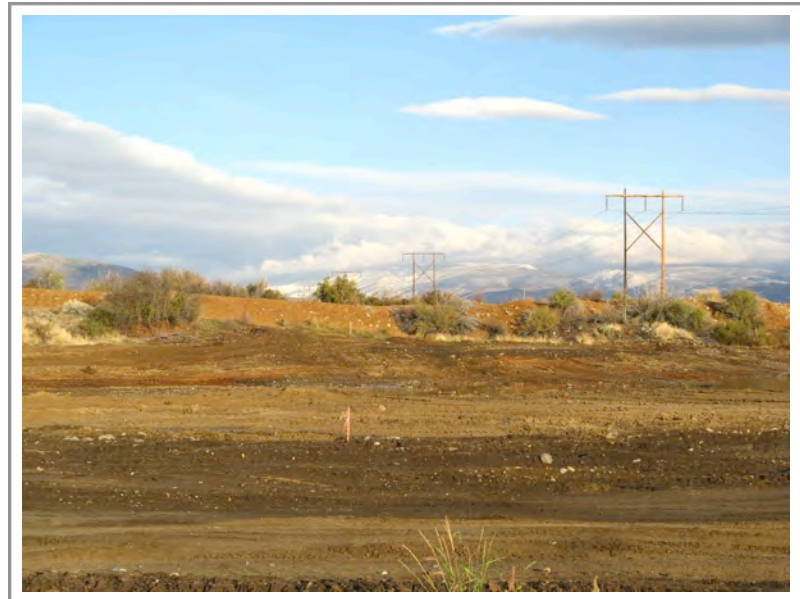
Upper section of Subarea 4—looking to the west toward the large irrigation ditch along edge of floodplain
